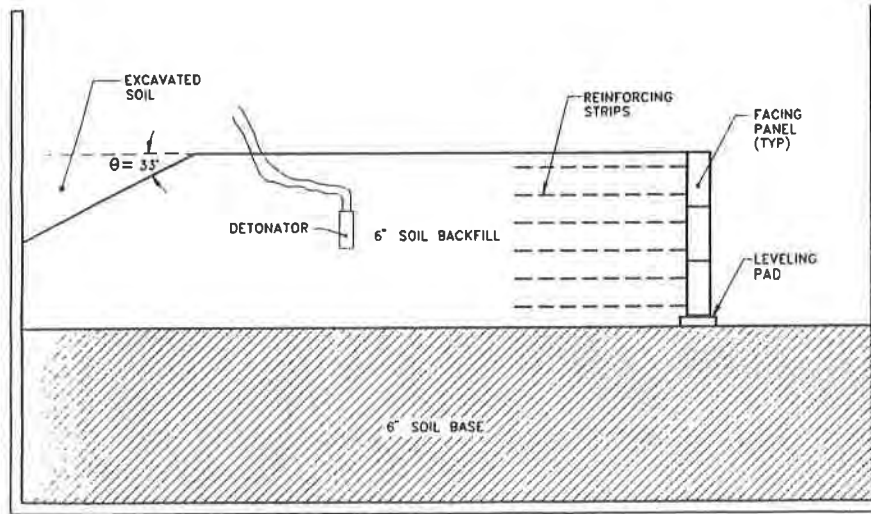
Model Reinforced Soil Wall with Slope (Olen, et. al., 1993).
